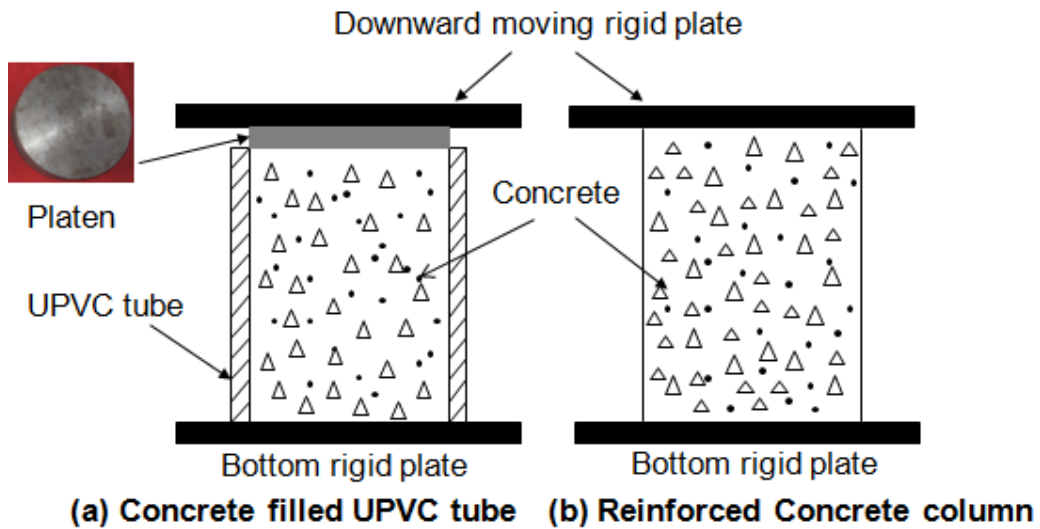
Setup for loading: (a) concrete filled UPVC tube (b) RCC column
